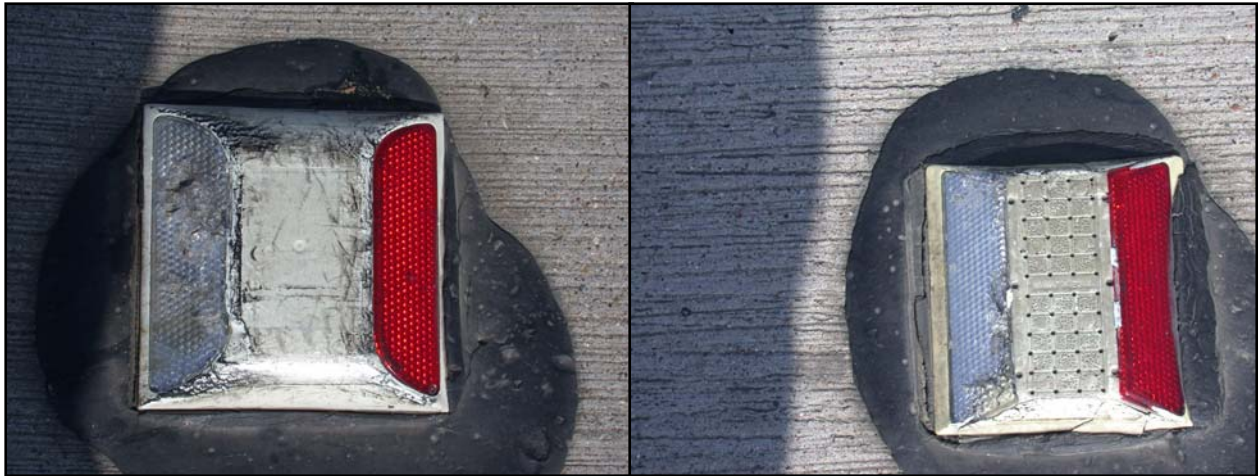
Typical RRPM Damage on Concrete Pavement in Rural Laredo (Continued).
